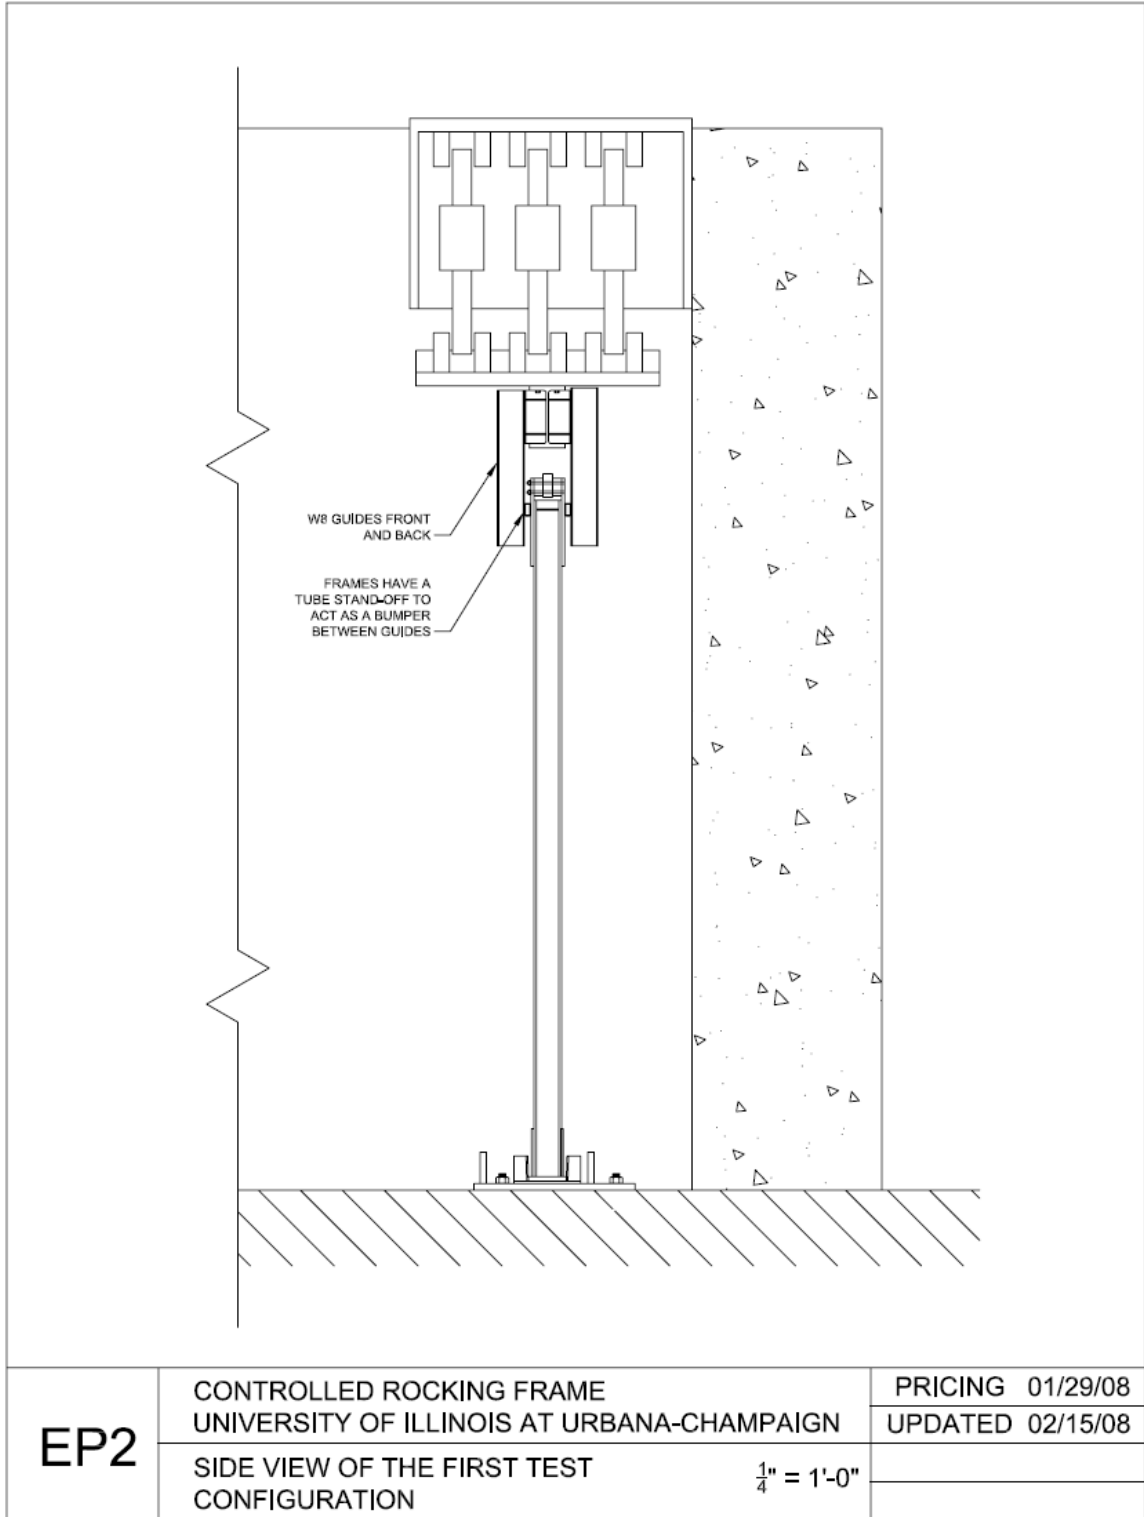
Erection Plan Drawing – Side View for Specimen A1
